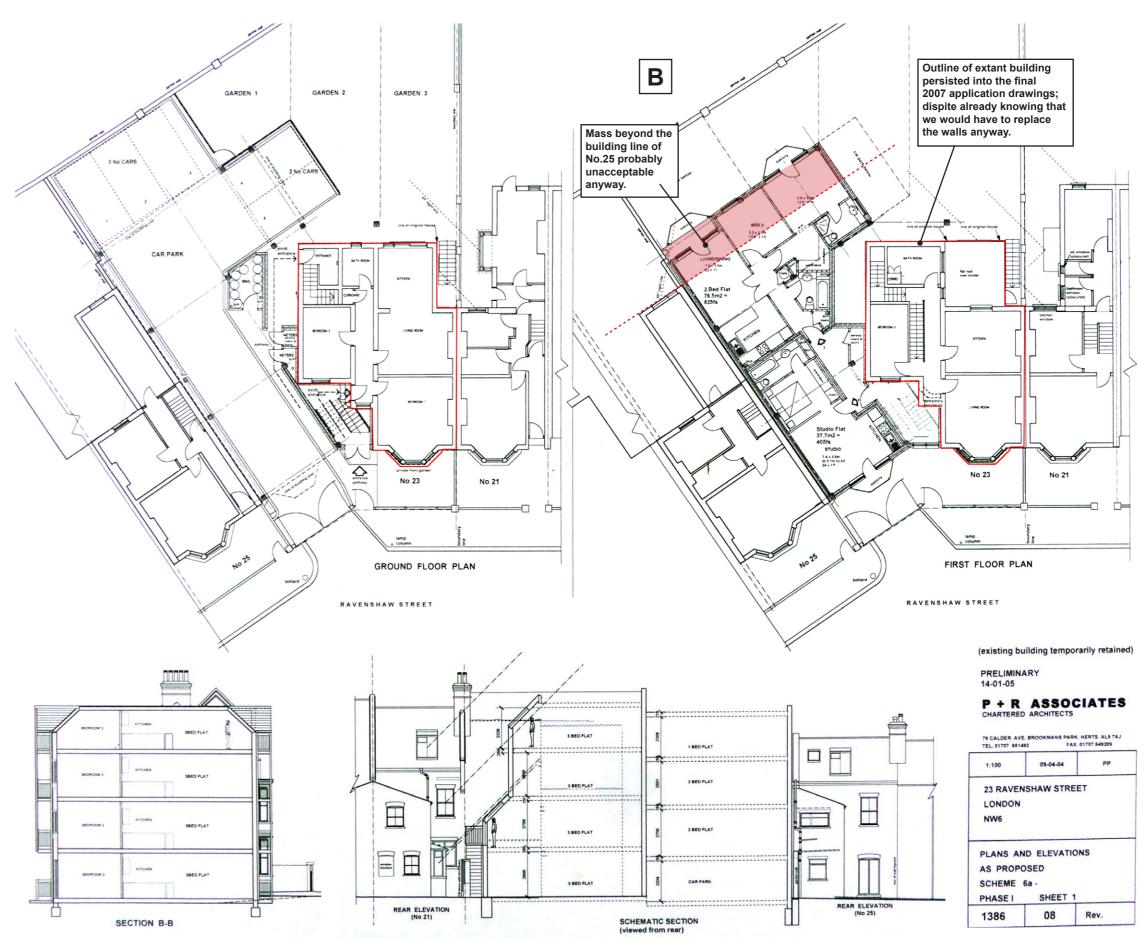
Withdrawn 2007 Final Application Drawing. Having originated from plans designed to retain the original building shell, the final plan retains vestages of the old buildings layout (and the restriuctions that go with it) - despite, by this time, it being 100% new build.
